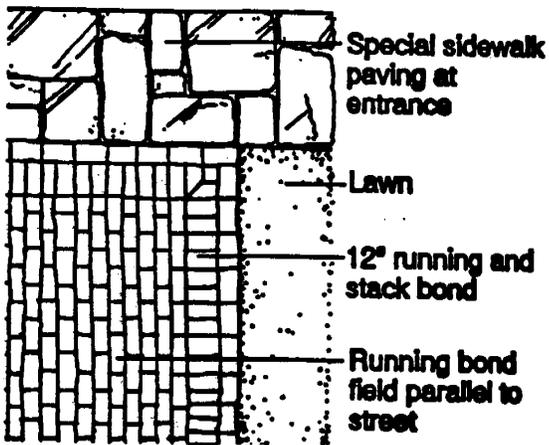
Eisenhower Precinct - Typical Paving Pattern
